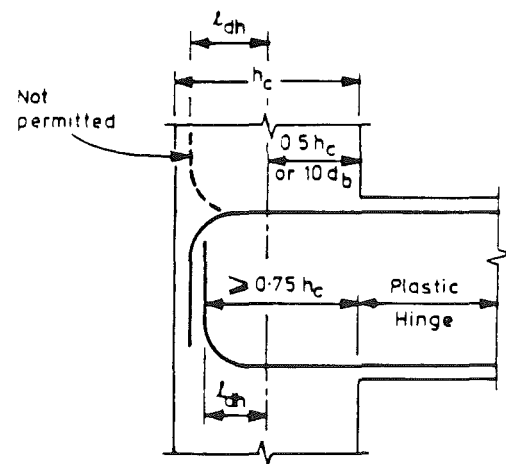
Anchorage of beam bars when critical section of plastic hinge forms at column face [4]
